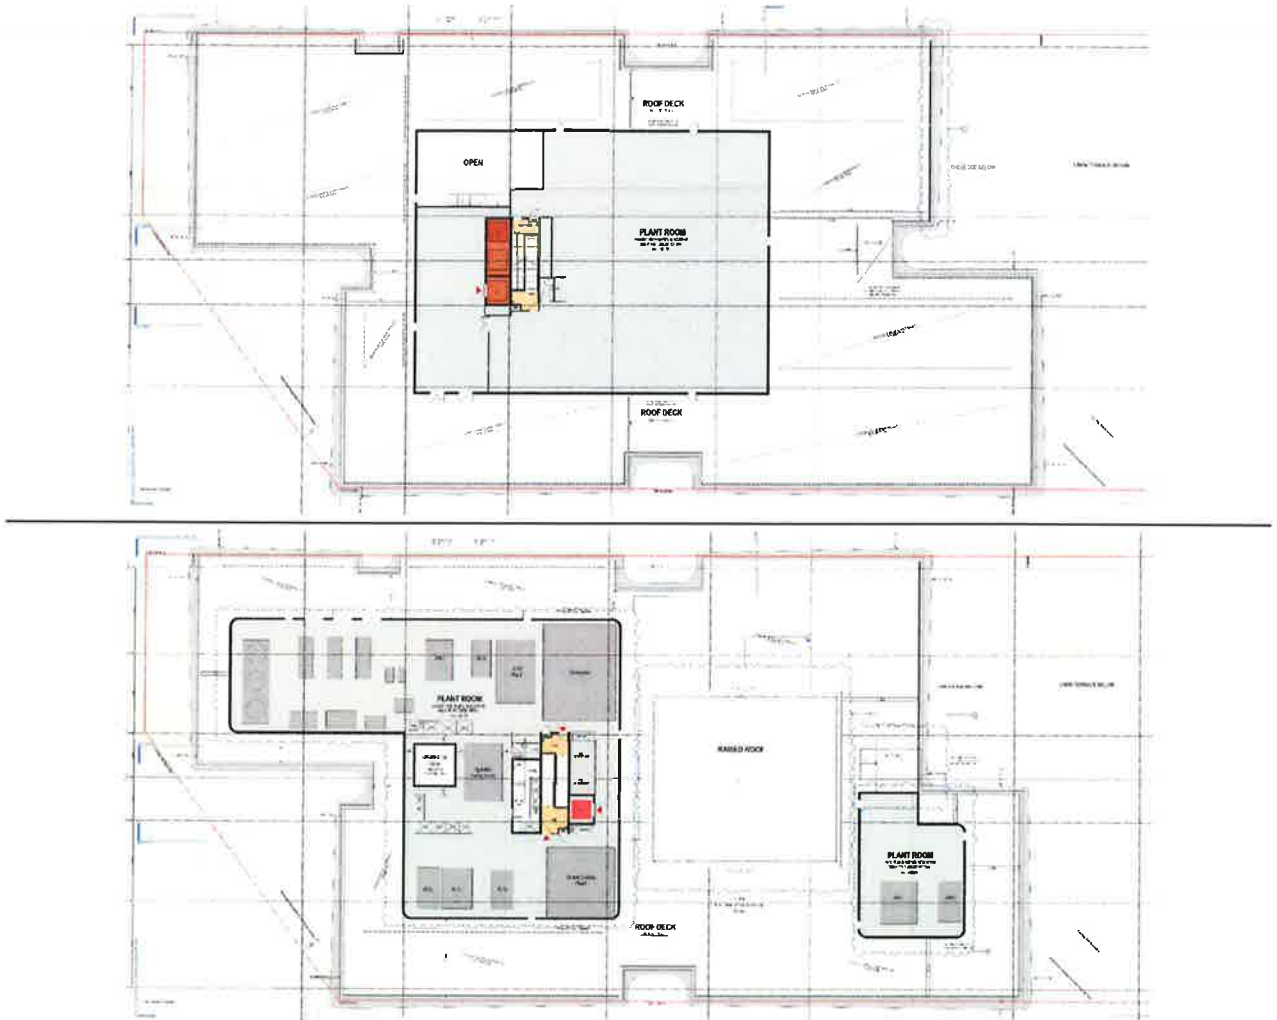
Approved (top) and proposed (bottom) plant enclosure layout (Source: SSD 6076 MOD 1 and applicant's EIS)
